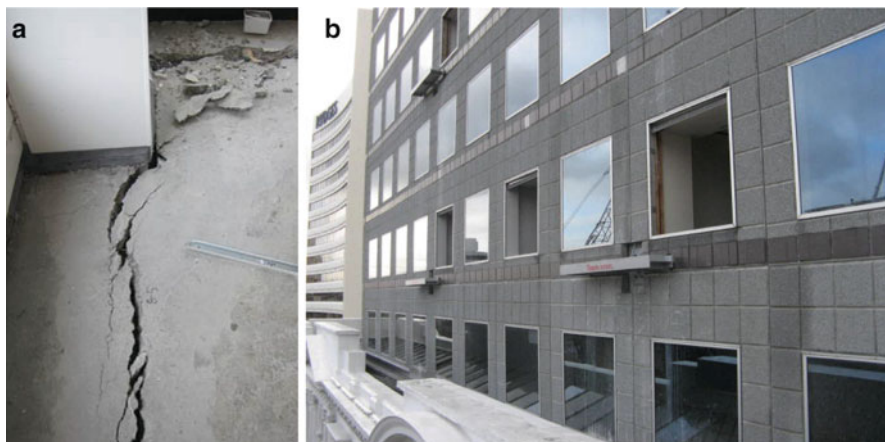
(a) Separation of precast floor slabs from supporting perimeter moment frame in 18-storey office building. Photo (b) (Courtesy of D. Bull) shows temporary supports for columns after earthquake
